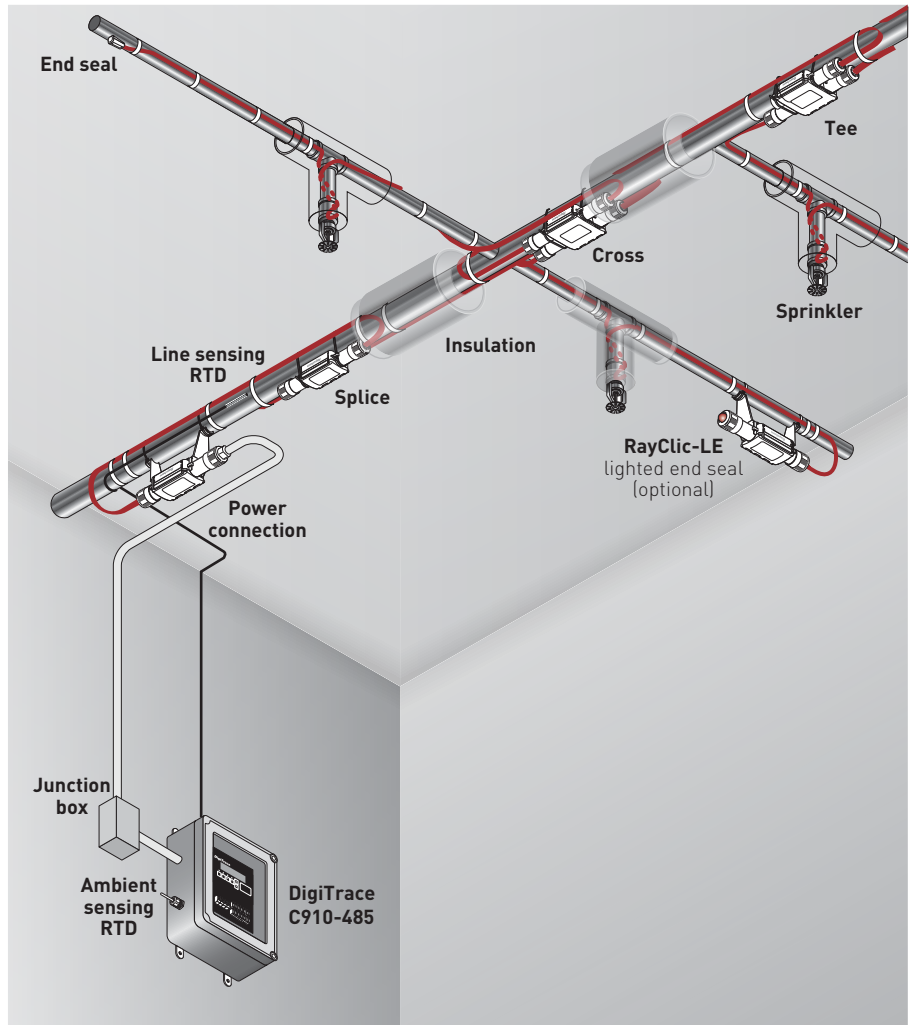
Typical fire suppression system for branch lines with sprinklers
